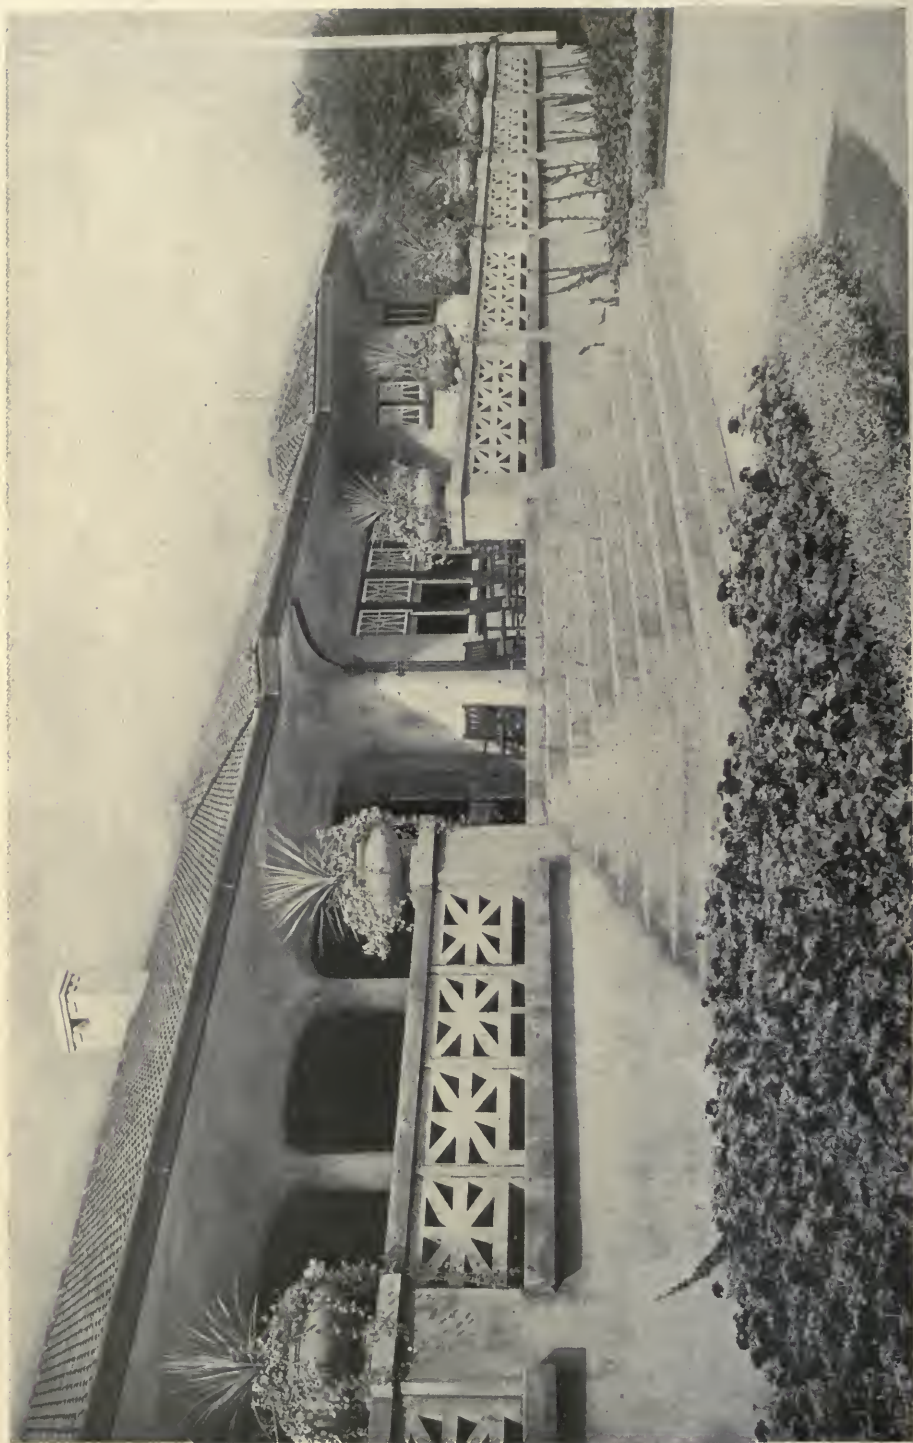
SHOWING CONCRETE USED IN THE CONSTRUCTION OF A PORCH BALUSTRADE.
